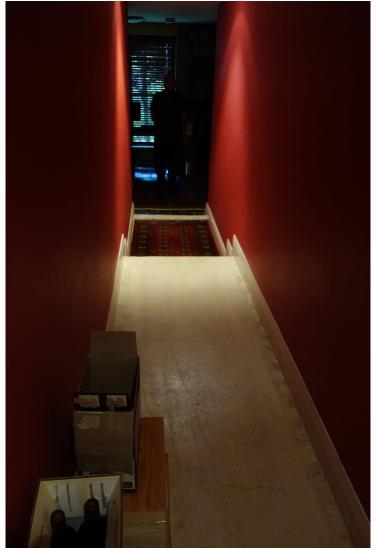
View up the internal staircase from the lower ground floor. The lower ground floor was a 1960s addition, with possibly later added (1990s) internal hall and staircase linking to the ground floor above.
